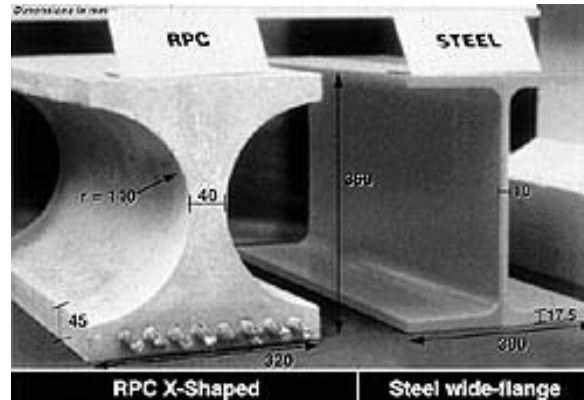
Reactive Powder Concrete (RPC) Prestressed X-Beam
